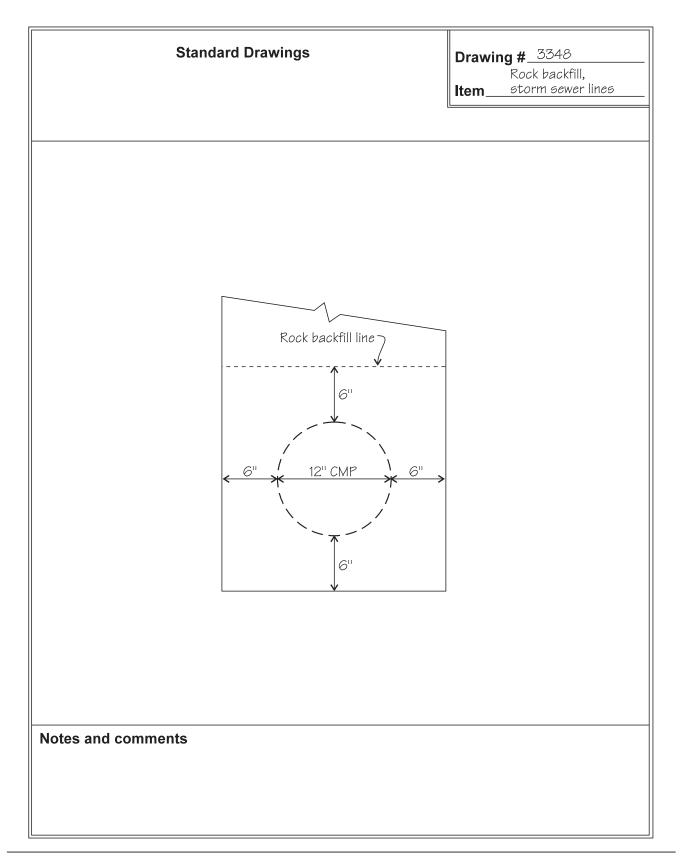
Standard drawing, storm sewer lines with rock backfill
